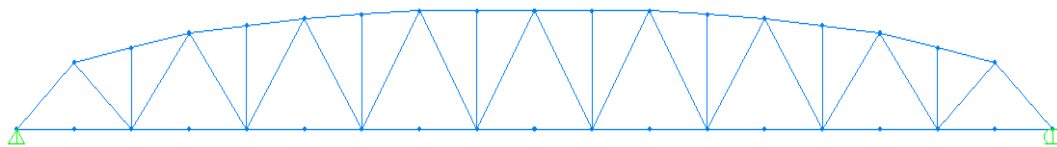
SAP Model of the Ohio Truss Bridge Used for Investigation
